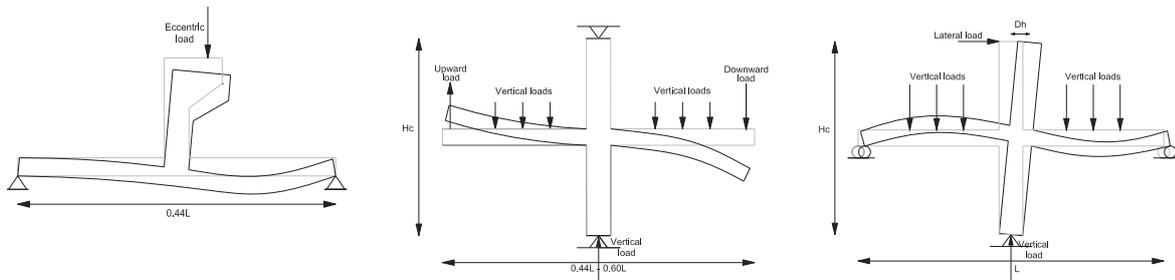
Test setup configurations used in previous experimental campaigns for slab-column connections with moment transfer
